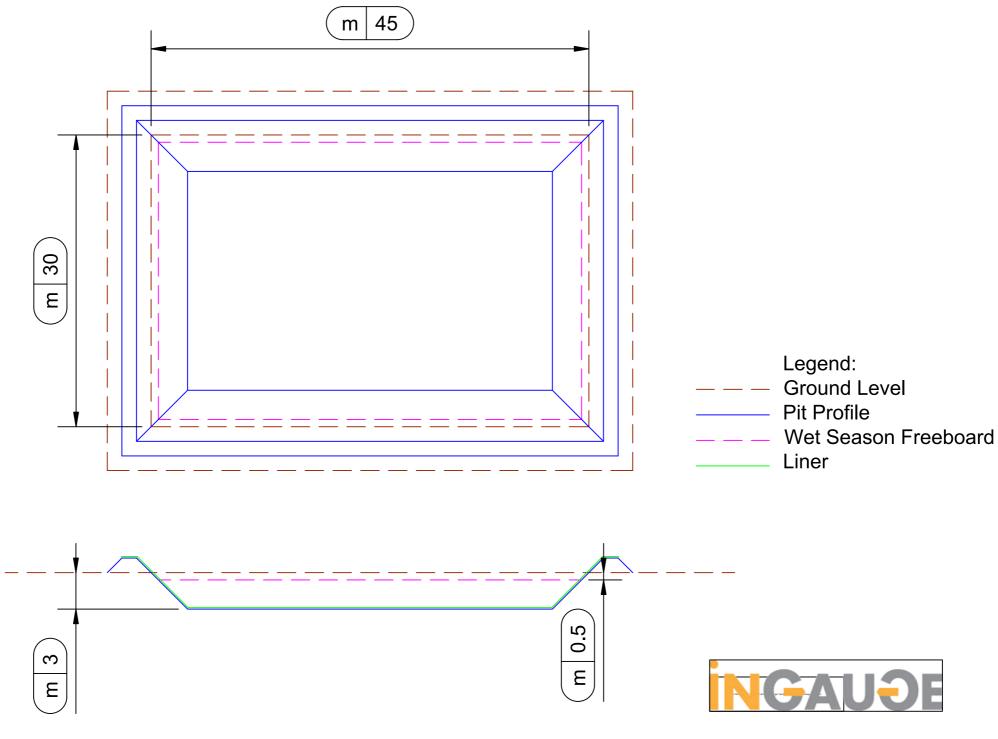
3 Well Pad Layout – Typical Pit Profiles
